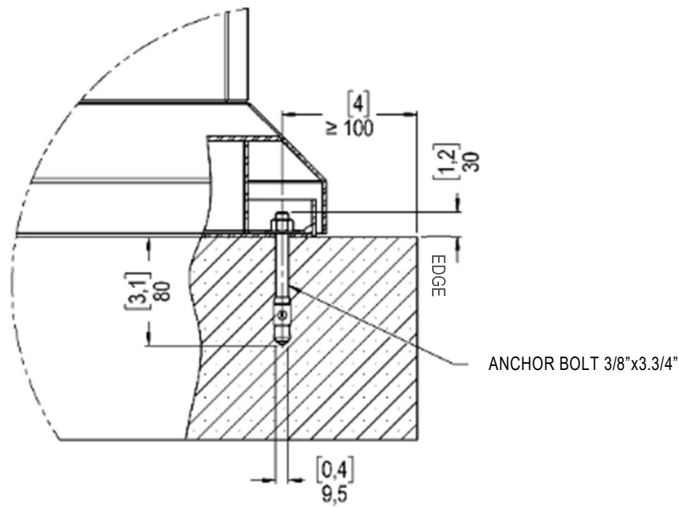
Pole anchor bolt detail in inches and mm - ["] mm
